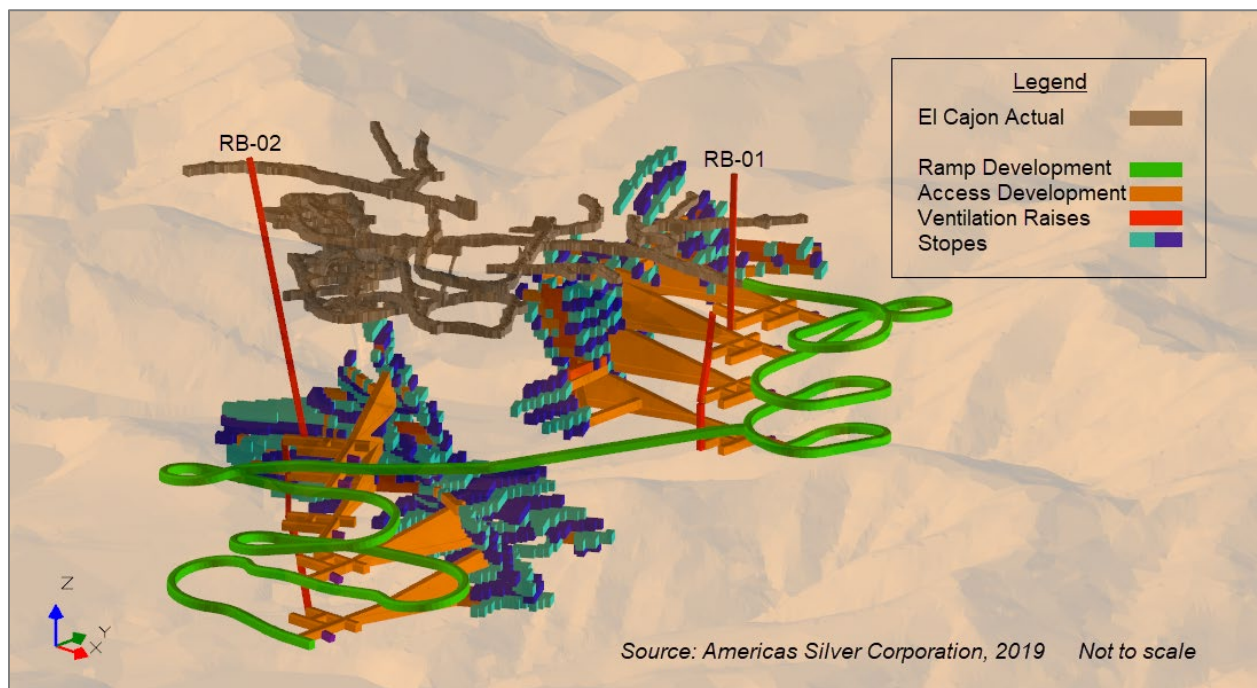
EL CAJÓN MINE DESIGN LAYOUT
